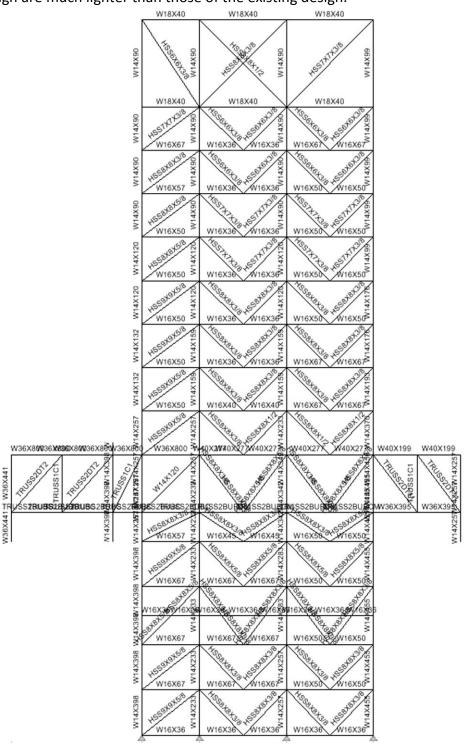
Braced Frame 1 and 2 Design (for truss design members see Truss Design Sections)
